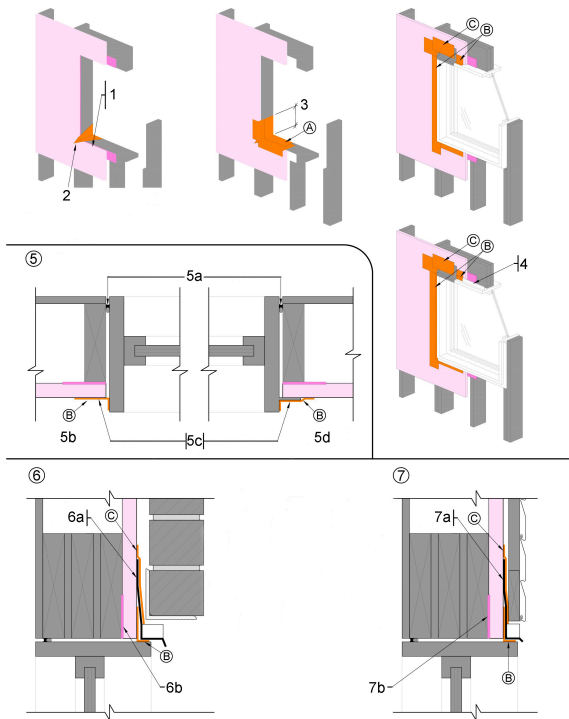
Sealing details around box and flanged windows (see manufacturer's literature for other sealing options)
